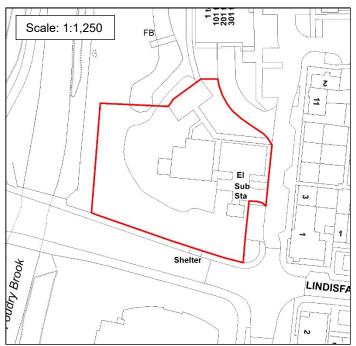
Former Sales and Marketing Suite, Drake Way
